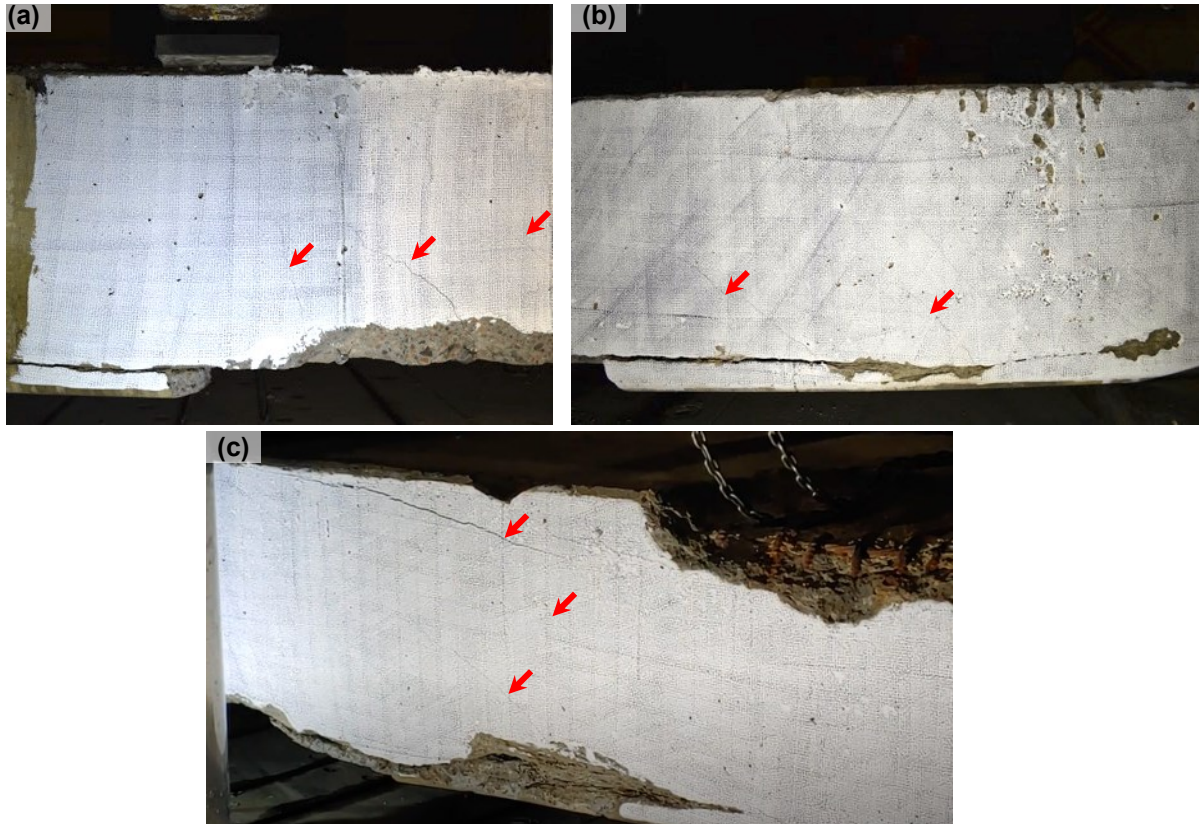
22:Strut formation with crack location indicated by arrows (a) Girder MD-1.5S (b) Girder ID-1.5 (c) Girder HD-1.
